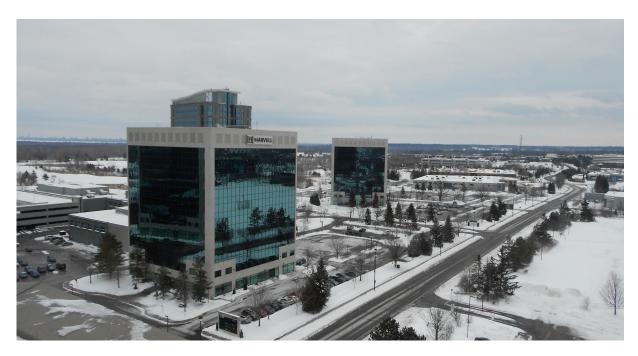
View of Site Building (Link 2 on right, Tower 3 on left) with loading dock ramp, facing south.
